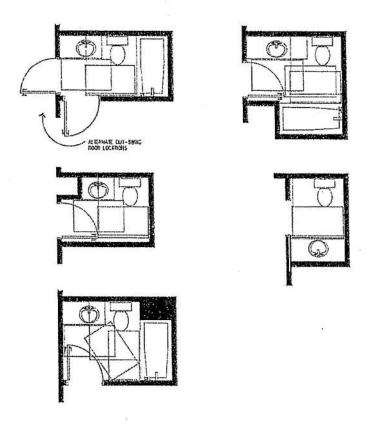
EXAMPLES OF BATHROOMS WITH FLOOR AREA TO SUITE "MINIMALLY ACCESSABLE" REQUIREMENTS
